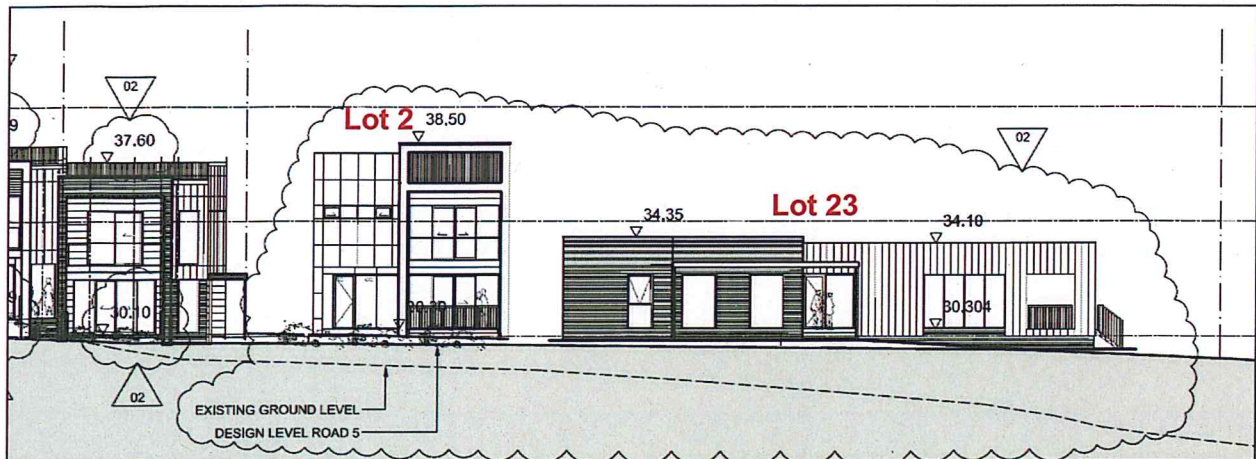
Front elevation as approved (source: MP10_0189 MOD3)
